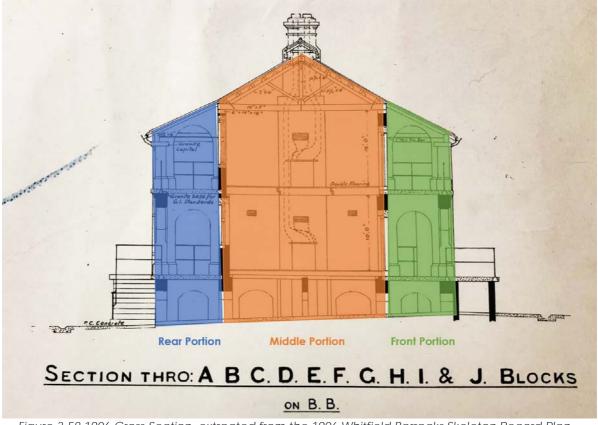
1906 Cross-Section, extracted from the 1906 Whitfield Barracks Skeleton Record Plan, sheet 3/3. Note that brick is in black; RC concrete is in dotted hatch; capital of 1/F verandah columns and verandahs balustrades' base are denoted as granite, floors of main spaces are denoted as double flooring. Between verandah internal wall and column on external side, a tie bar is indicated. There is no annotation for door thresholds, but as observed from the hatching, they may be of granite as well. (Source: TNA WO78#3744, with Author's edition).
